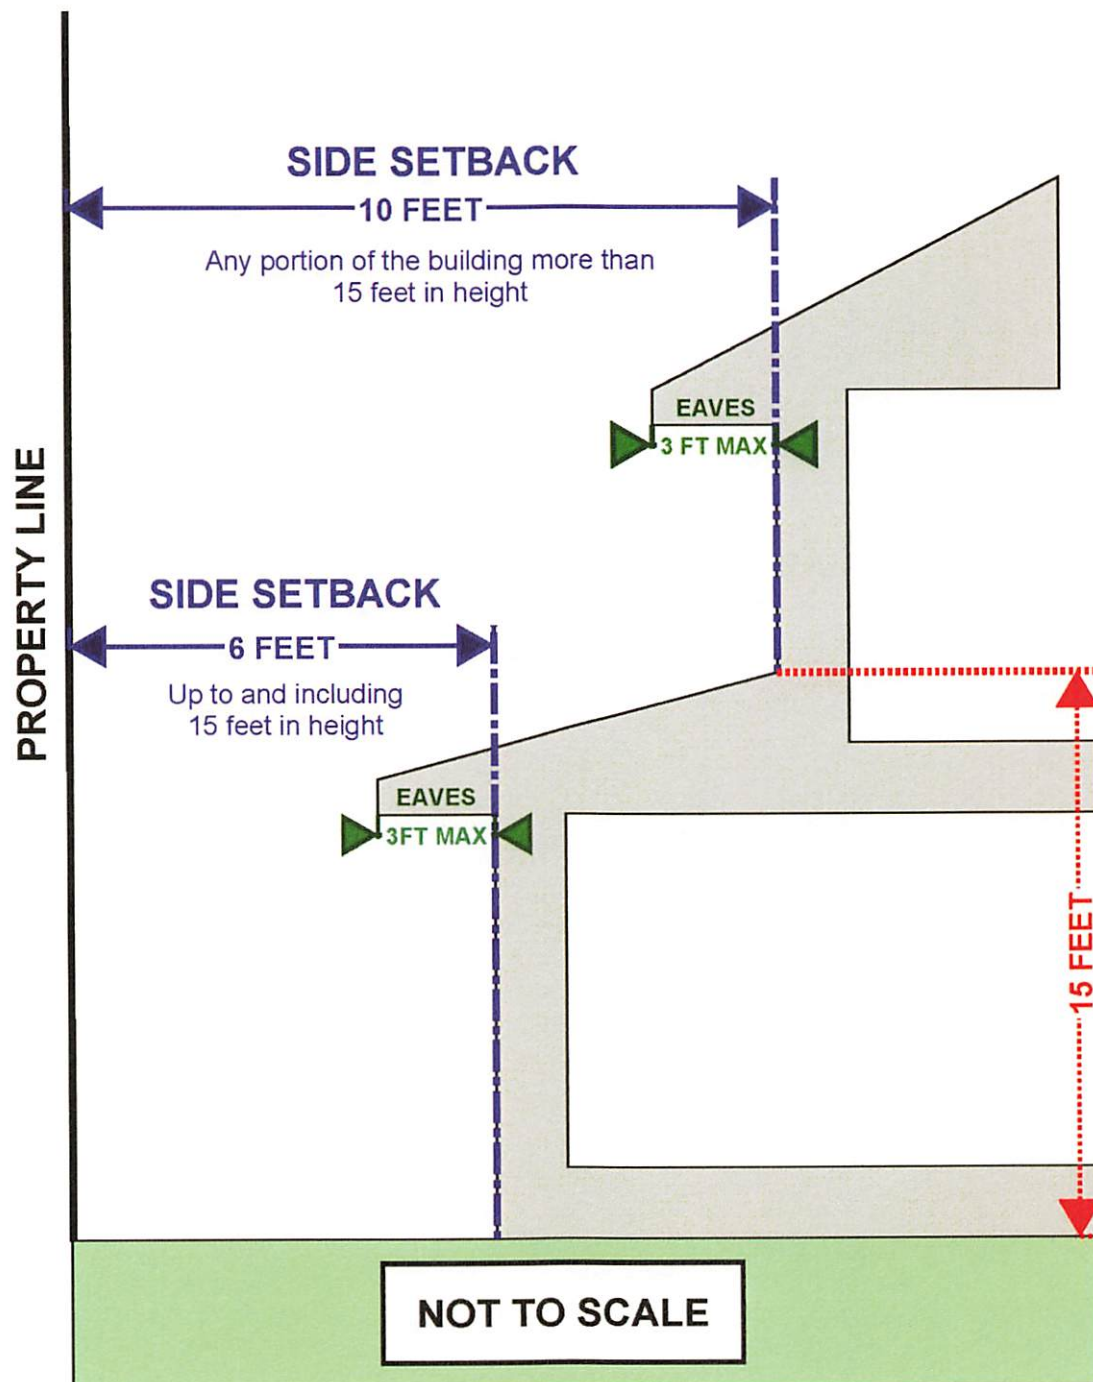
Example of rear and side setback areas for single-family dwelling >15 feet in height (not to scale)
